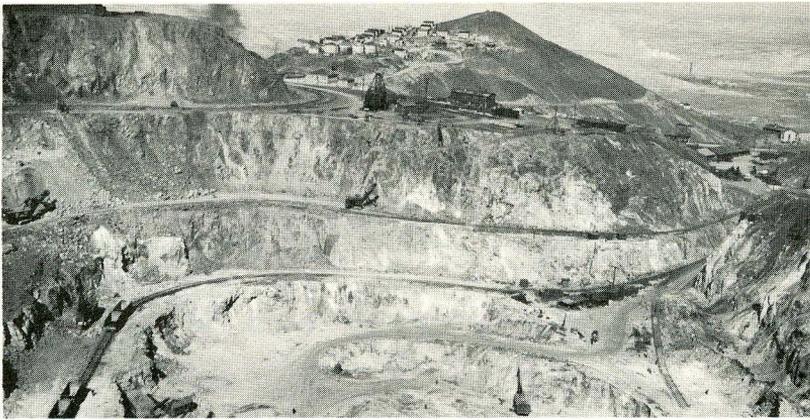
View of pit in October, 1935. With the construction of the cut into the pit in the 300 level, the pit surface plant was moved down to that level. Track was laid into the pit on two grades, one line to the third bench (elevation 5240), the other to the fifth bench (elevation 5178). On the extreme left, a 120-B, 4-cubic yard, shovel can be seen waiting for a waste train to come in. Below it, another 120-B shovel is loading ore into 100 ton V. T. & S. R. R. cars for direct shipment to the smelter which can be seen in the upper right. (Compare with Figure 10 which views the same area in 1928.)
